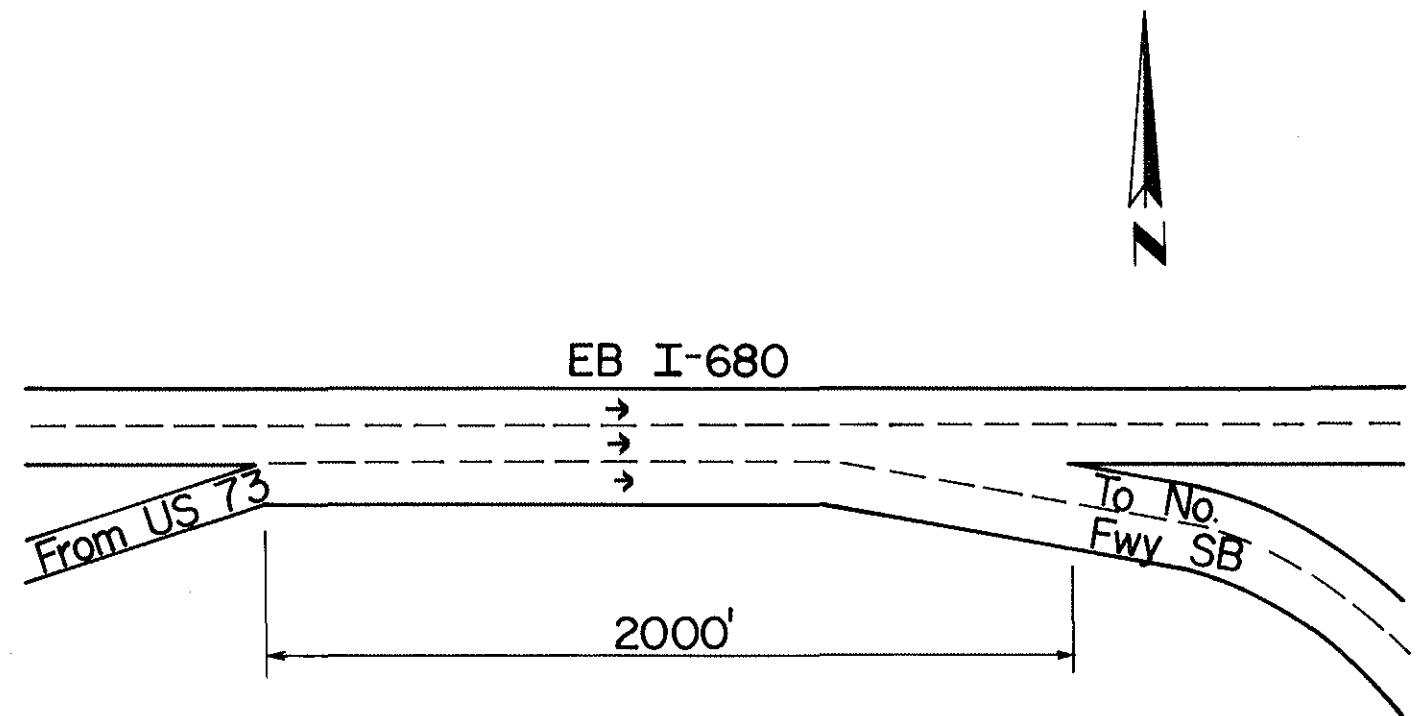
Weaving Section, US 73 To North Freeway Ramp, East Alignment
